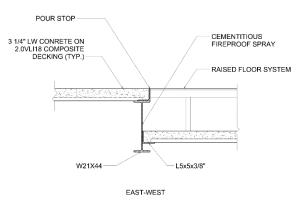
DIFFERENTIAL SLAB ELEVATION EAST-WEST
